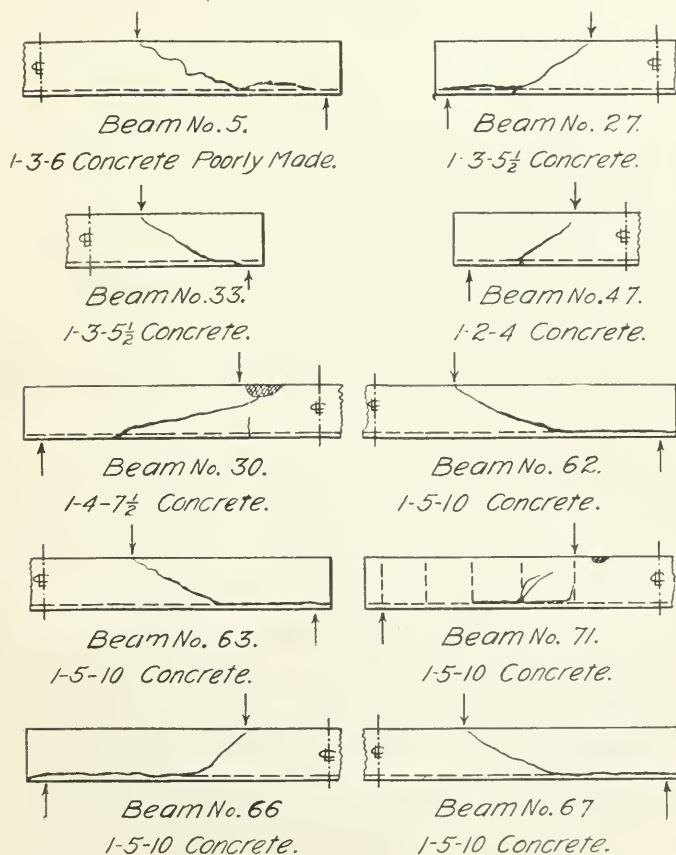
SKETCHES SHOWING BEAMS AFTER FAILURE.
